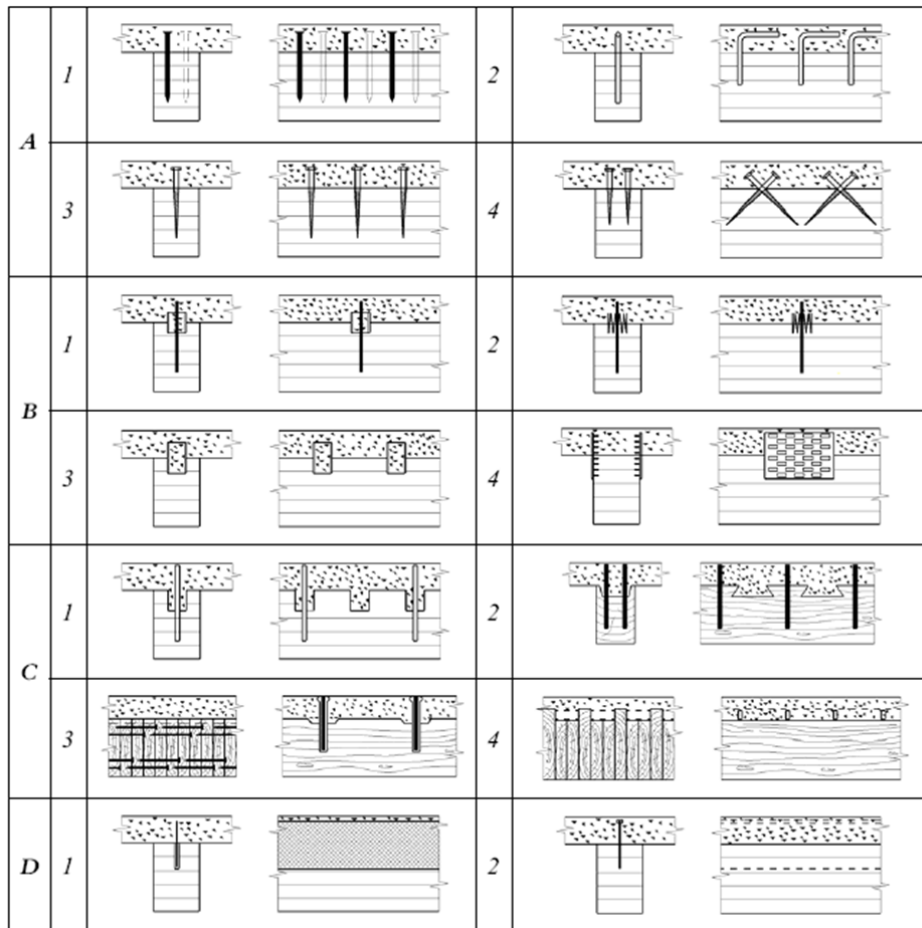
examples of timber-concrete connections with: nails (A1); glued reinforced concrete steel bars (A2); screws (A3); inclined screws (A4); split rings (B1); toothed plates (B2); steel tubes (B3); steel punched metal plates (B4); round indentations in timber, with fasteners preventing uplift (C1); square indentations, ditto (C2); cup indentations and prestressed steel bars (C3); nailed timber planks deck and steel shear plates slotted through the deeper planks (C4); steel lattice glued to timber (D1); and steel plate glued to timber (D2)
